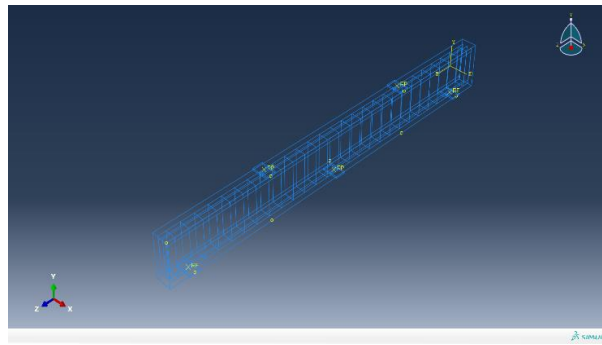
Assembly of GFRP Longitudinal bars and stirrups for continuous deep beam
